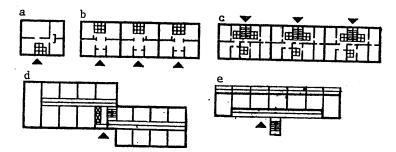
Diagrams of floor plans for different types of buildings. a--Single apartment; b--blocked; c--sectional; d--corridor; e--gallery.
